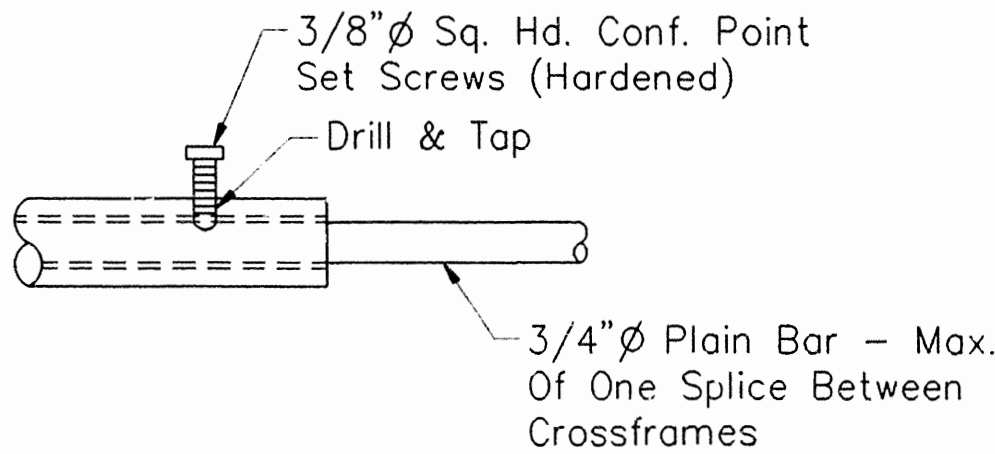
DETAILS OF FIELD ERECTED SAFETY HANDRAILS
